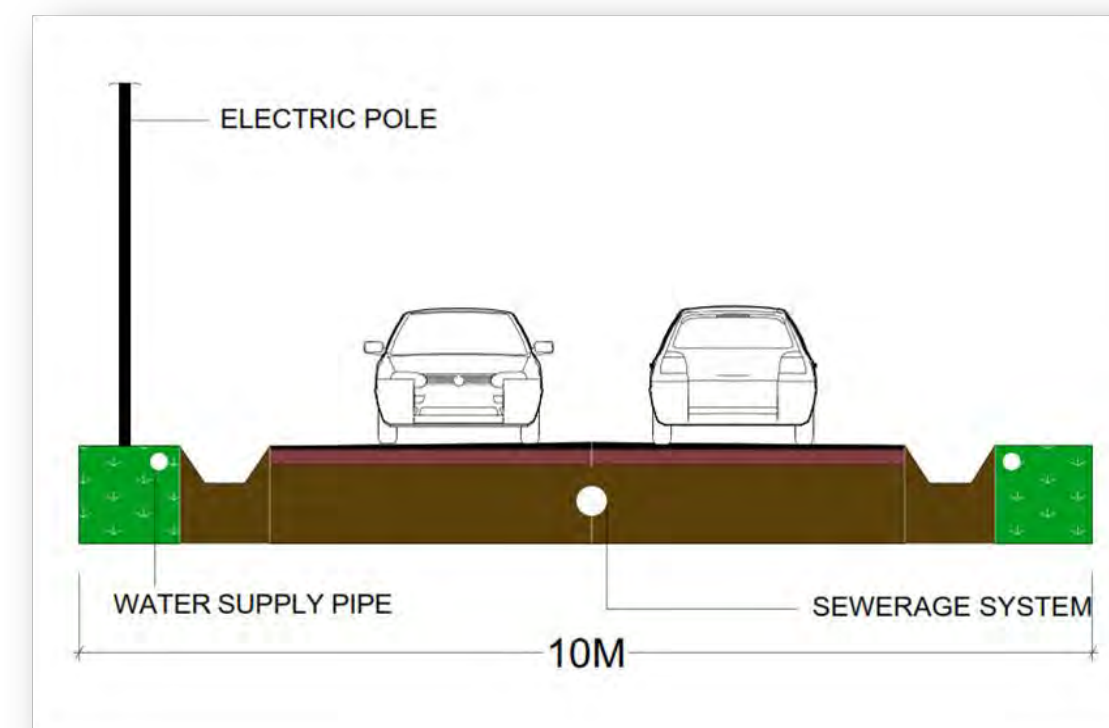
Section Example of Access Roads in Residential Areas (10-meter-wide road with 2 lanes)
